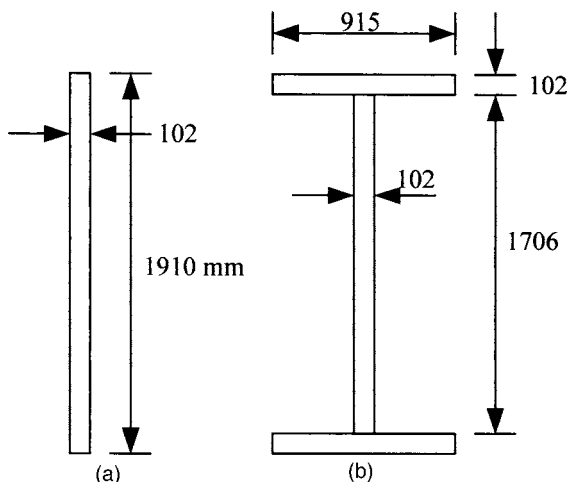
Details of PCA walls: (a) Wall R1; (b) Wall F1
